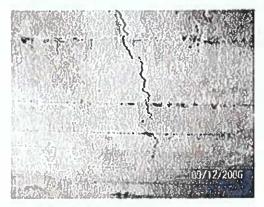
and Figure 28 - Cracked Concrete Box Culvert / Bridge
